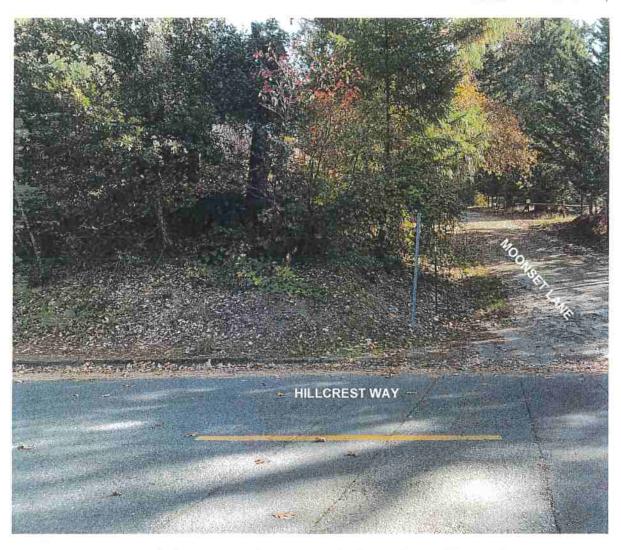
Facing East at Intersection of Hillcrest Way and Moonset Lane
